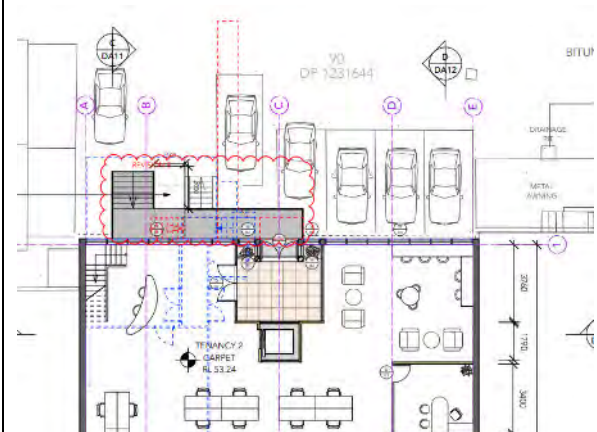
Rear of building with proposed stairs and lift, Proposed Ground Floor Plan
